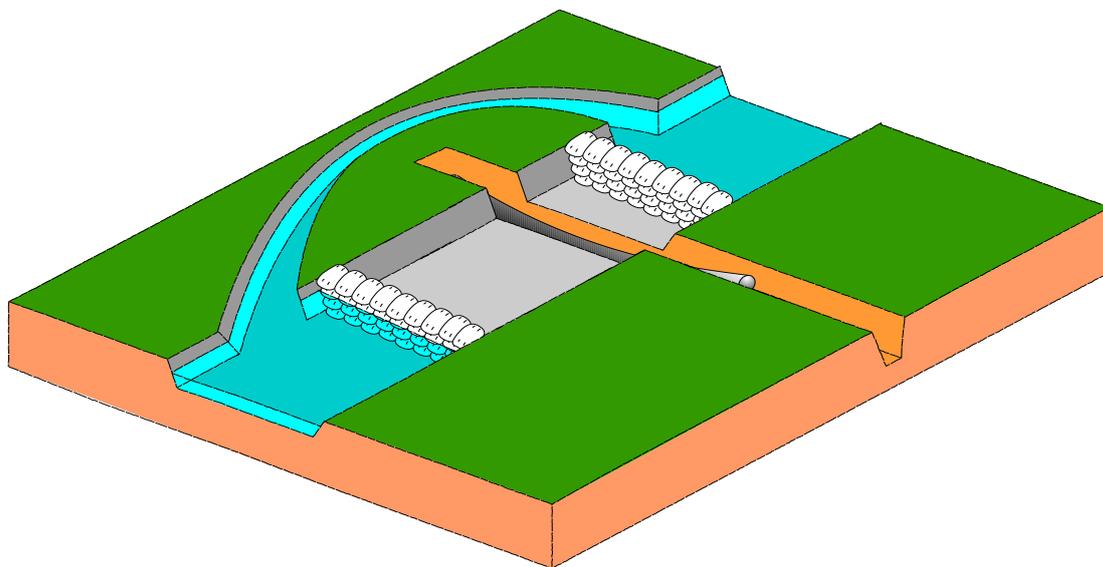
Schematic diagram of construction section of cofferdam diversion trench excavation method
